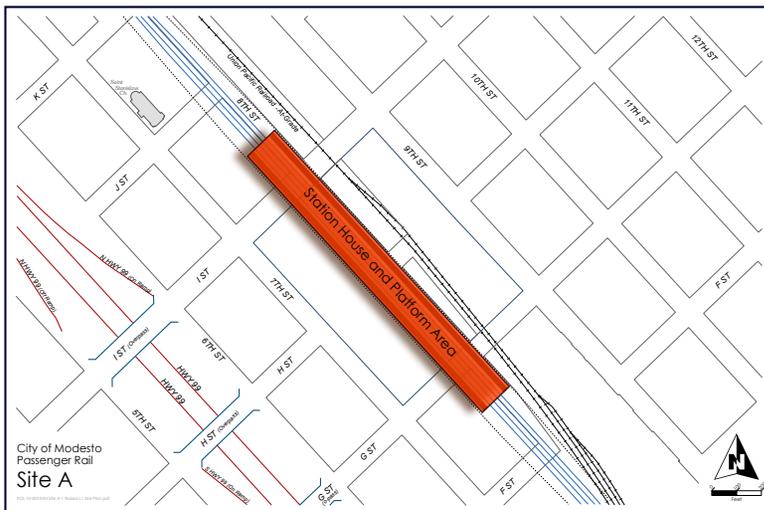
Conceptual Site Plan, Above-Grade Passenger Rail, Upper Level Station House
